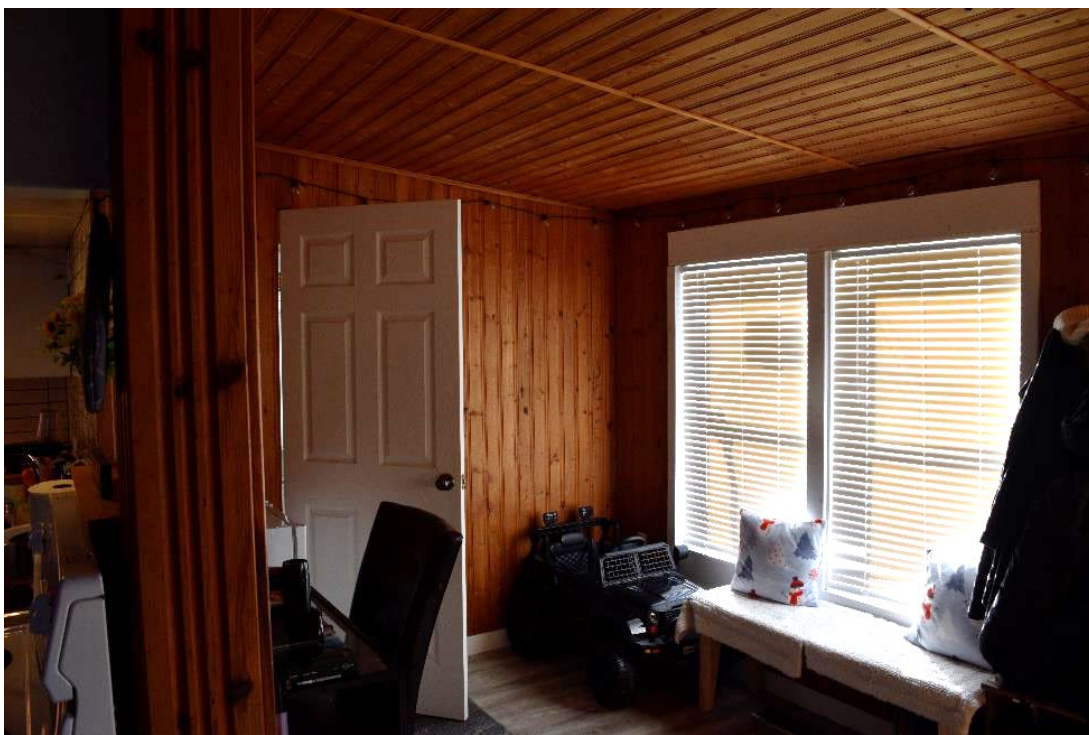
SOUTHWEST HALF OF SECOND REAR ADDITION, FACING SOUTHEAST
